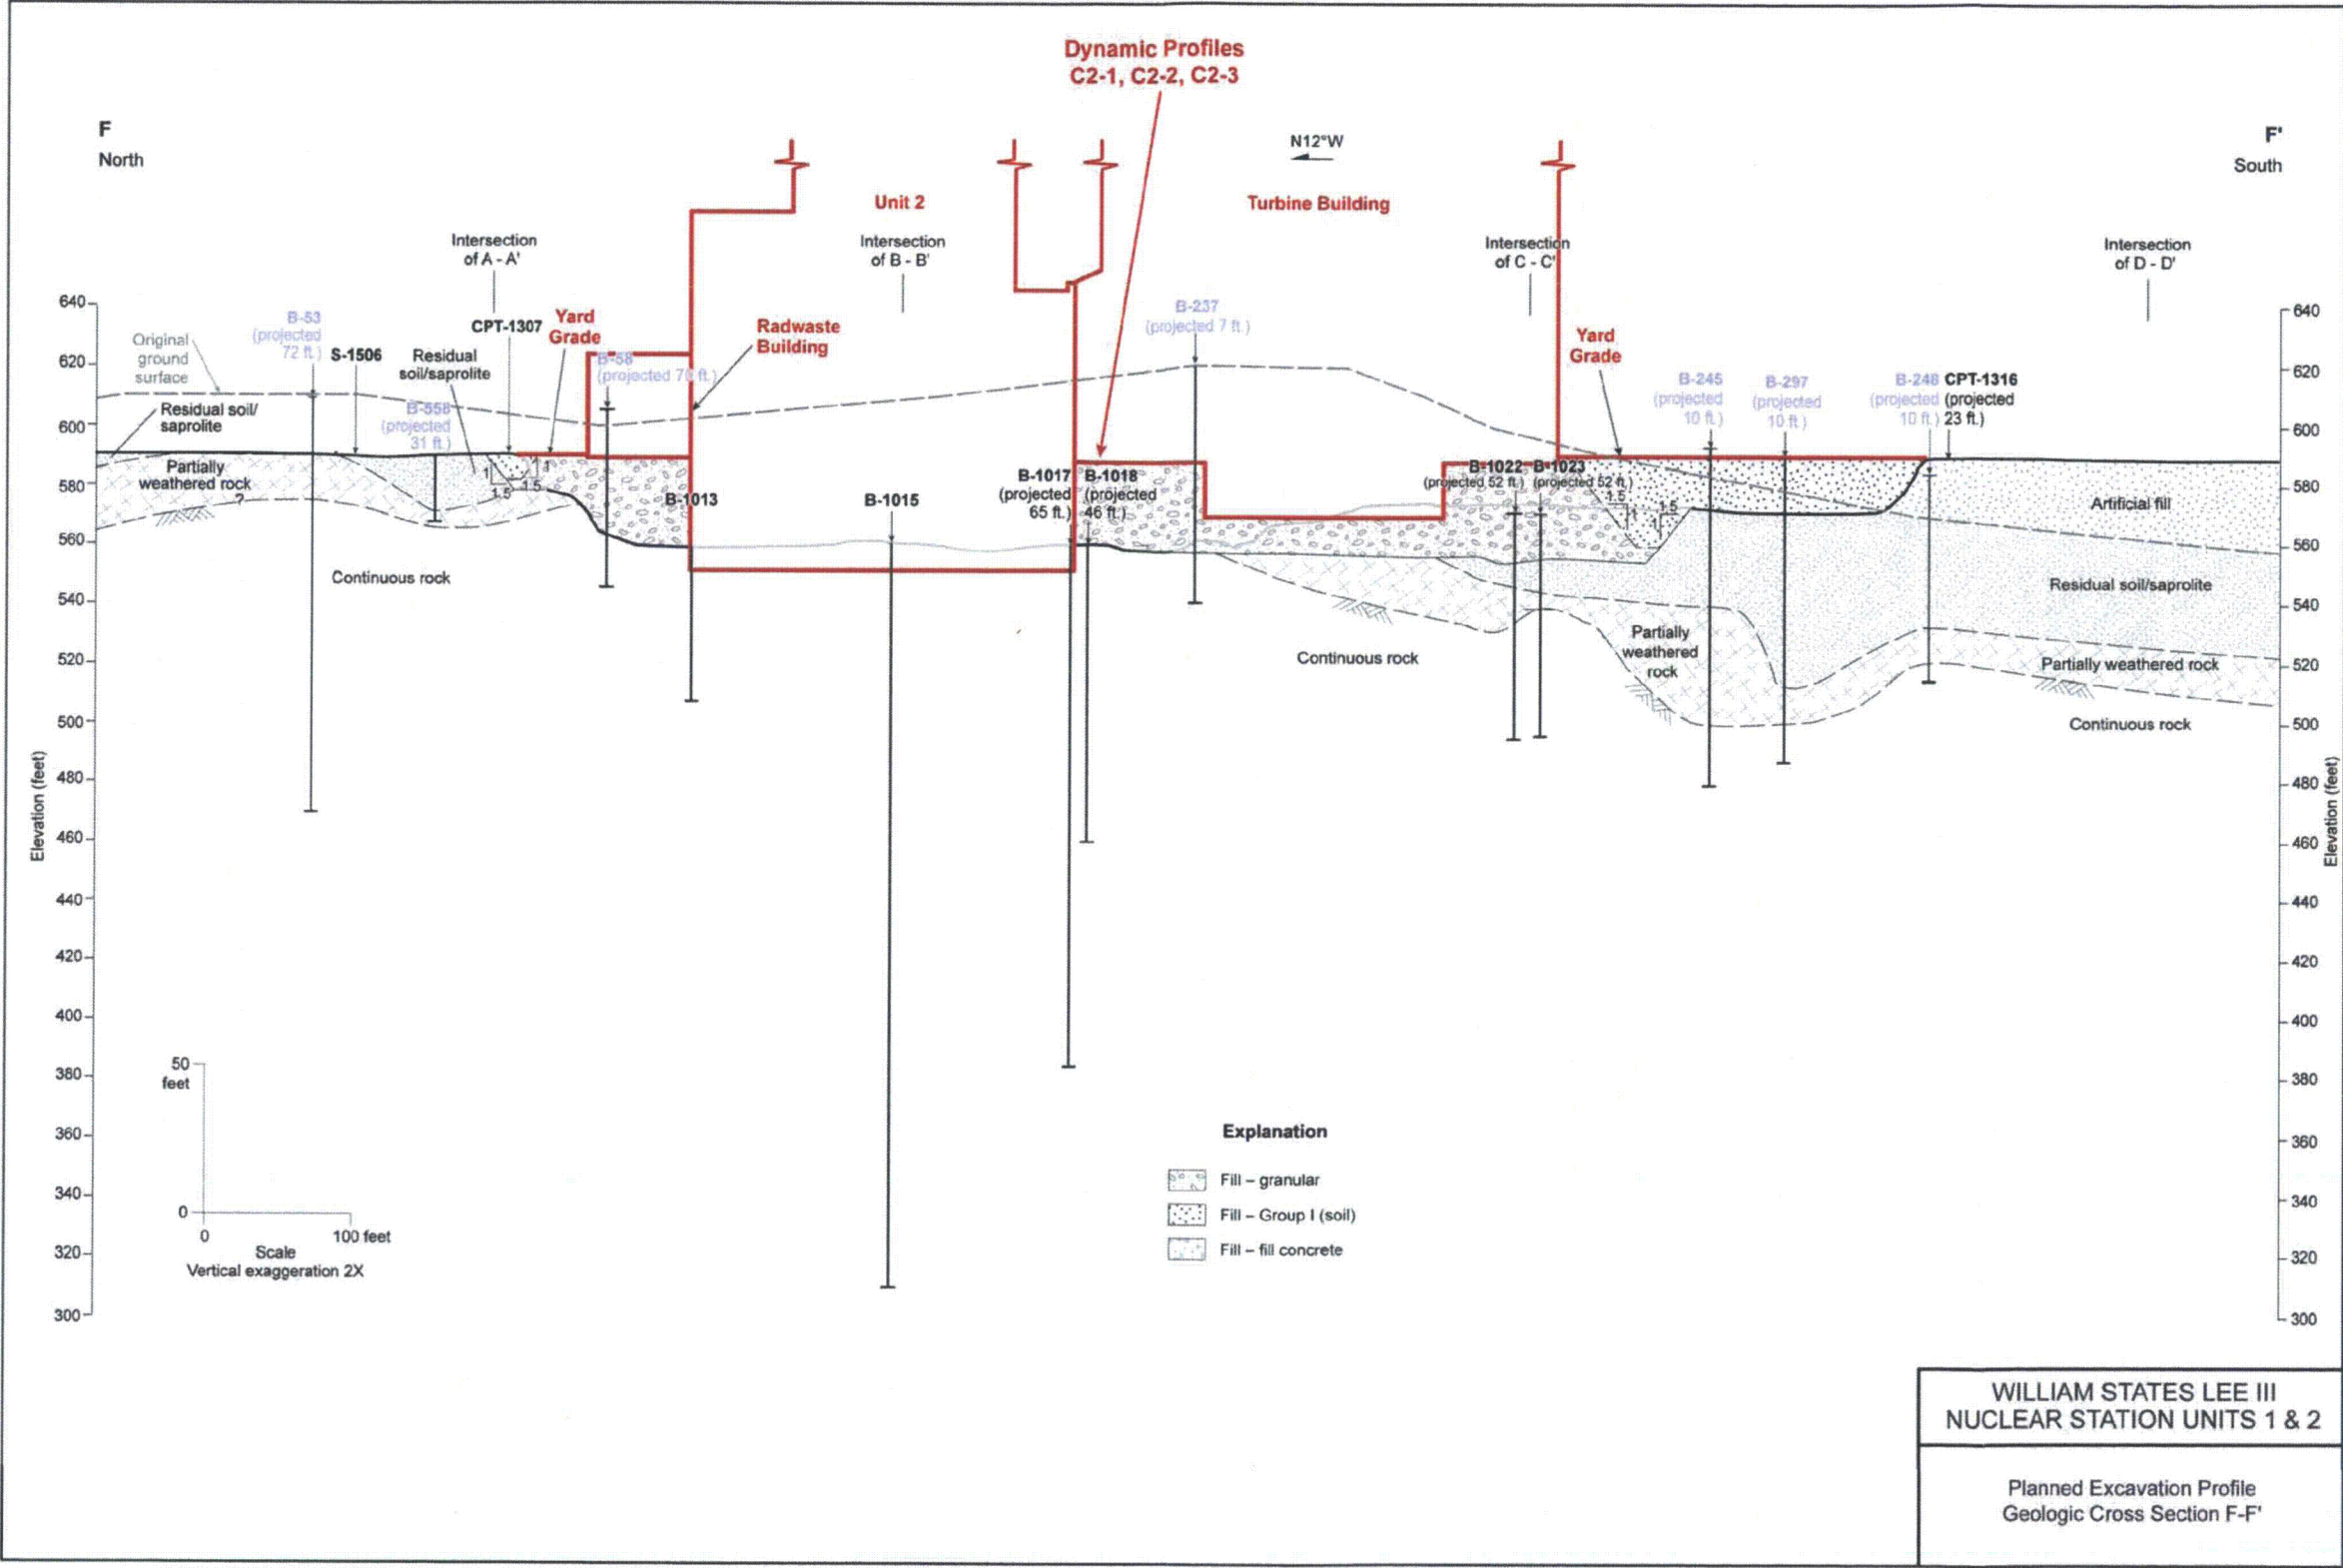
Planned Excavation Profile Geologic Cross Section F-F'
